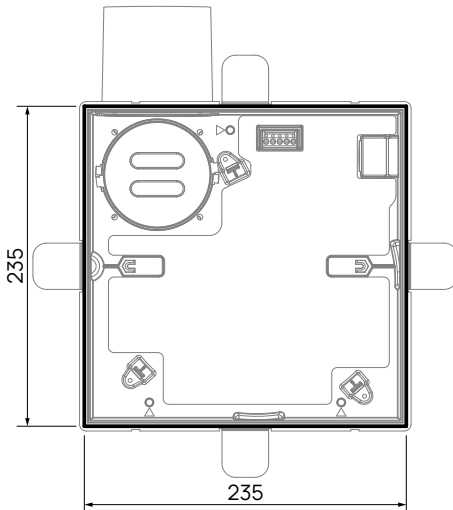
Dimensioned drawing – wall opening for flush-mounted Taris extractor fan
